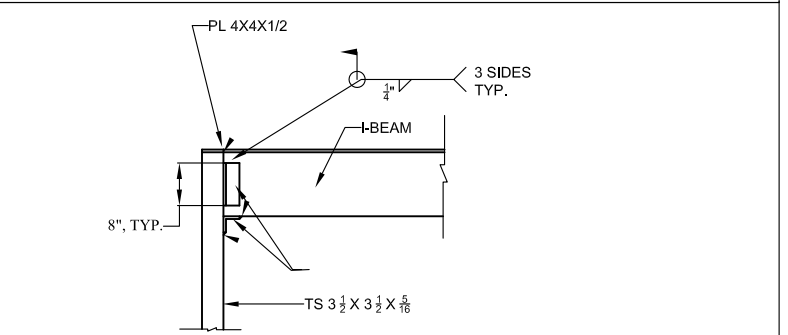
TYPICAL BEAM-COLUMN SHEAR CONNECTION
